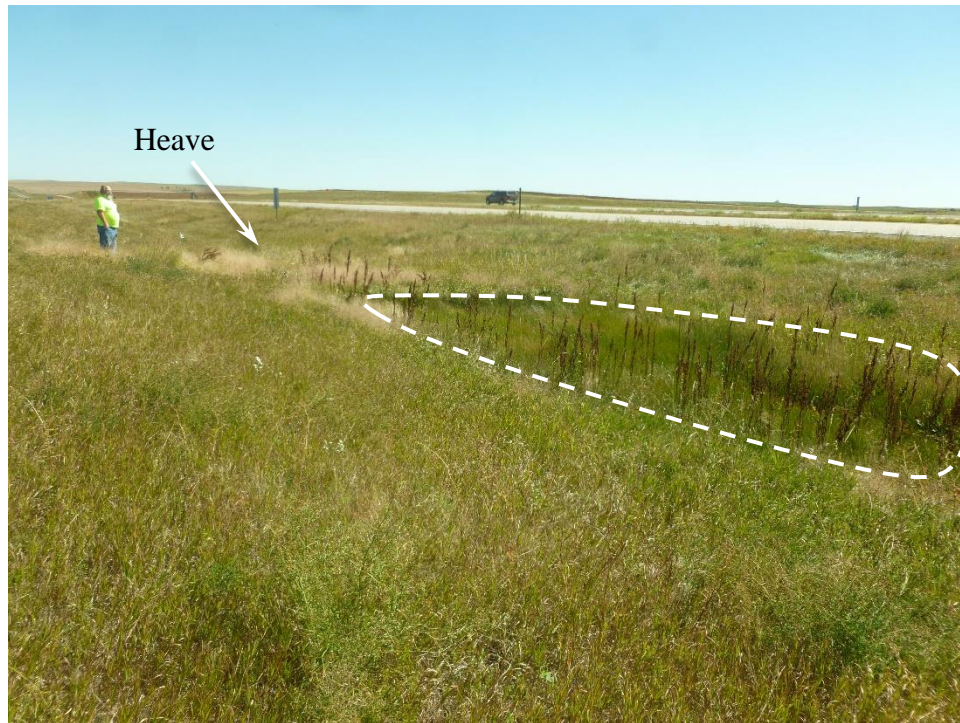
Site 2, another heave in center borrow with remnants of ponding in foreground.
